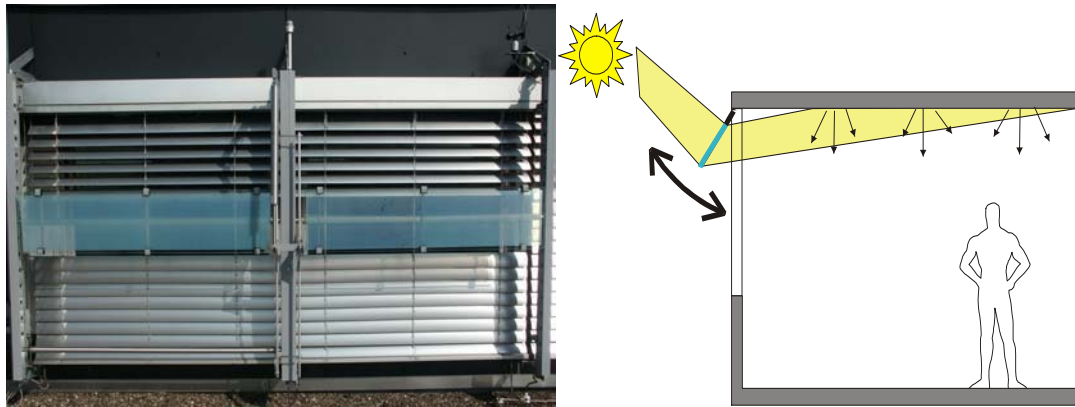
Test façade at University of Dortmund (Light directing system with conventional shading device)
